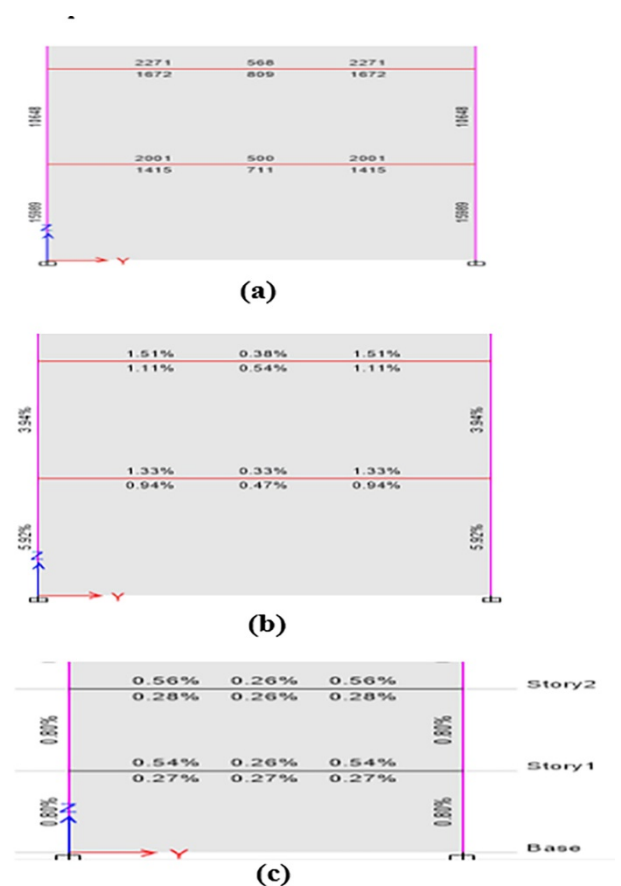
(a)Steel Reinforced of G+3 (b) Steel Reinforced of G+5 (c) Steel Reinforced of G+3
